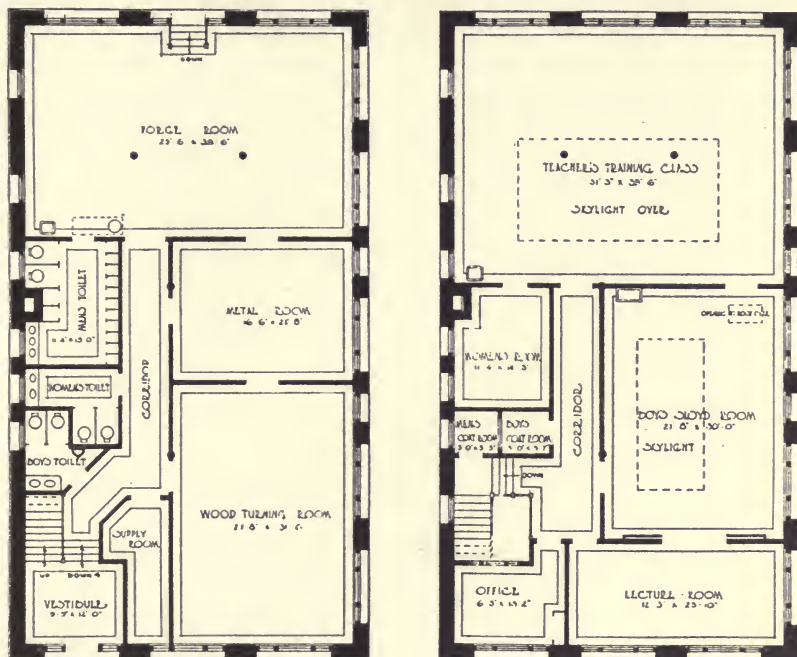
FLOOR PLANS, SLOYD TRAINING SCHOOL, BOSTON
